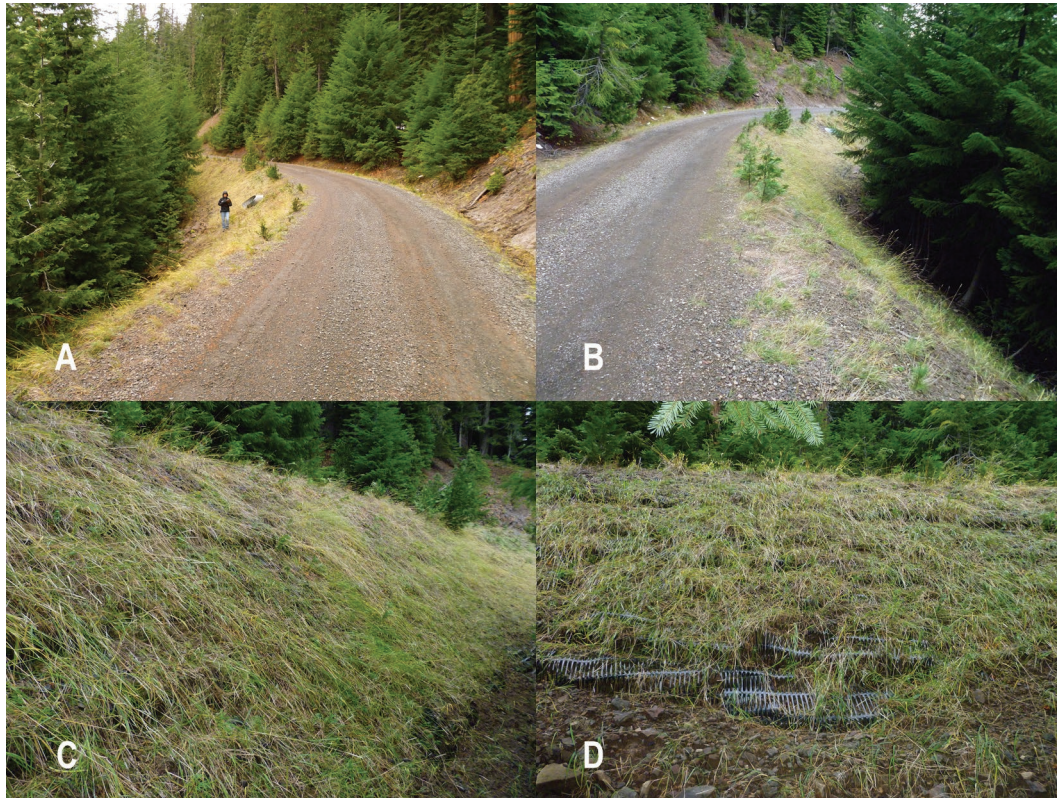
Photos of deep patch repairs at Site 12 on Road 6520, Rogue River-Siskiyou National Forest showing a) general layout of site and road surface, b) layout of site from other direction, c) embankment, d) exposed geogrid reinforcement in embankment.
